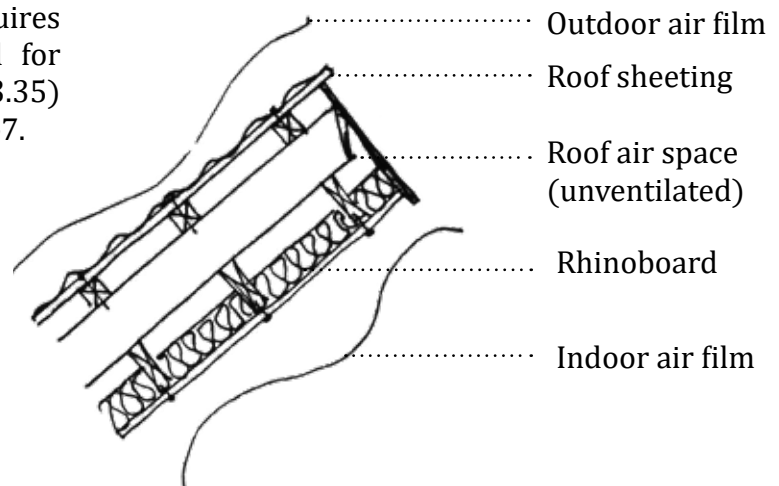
Roof Insulation (Caldeira, 2019: drawing).
